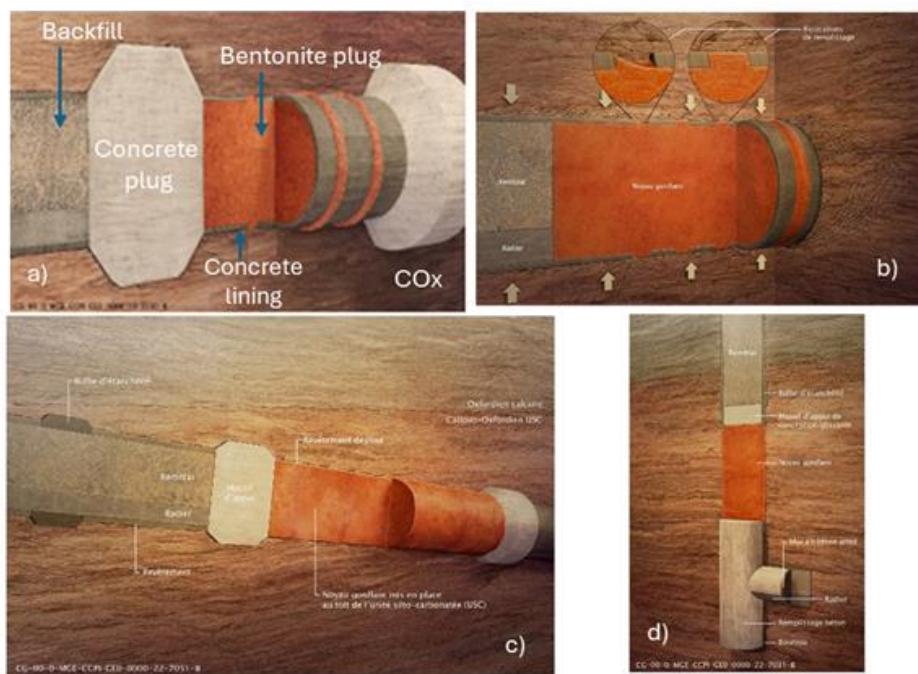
Seal designs – (a) horizontal tunnels core is confined between two concrete abutment (b) horizontal tunnels core is in contact with backfill, (c) in a ramp, (d) in a shaft
